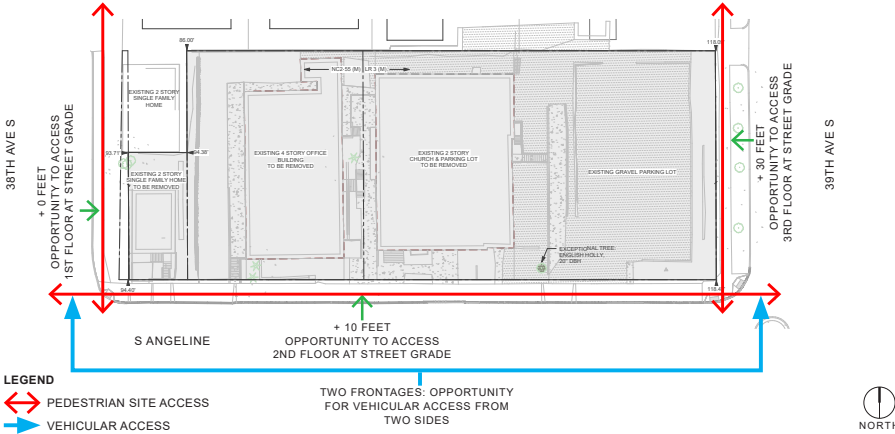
Site plan showing existing access opportunities which are captured in proposed design.
